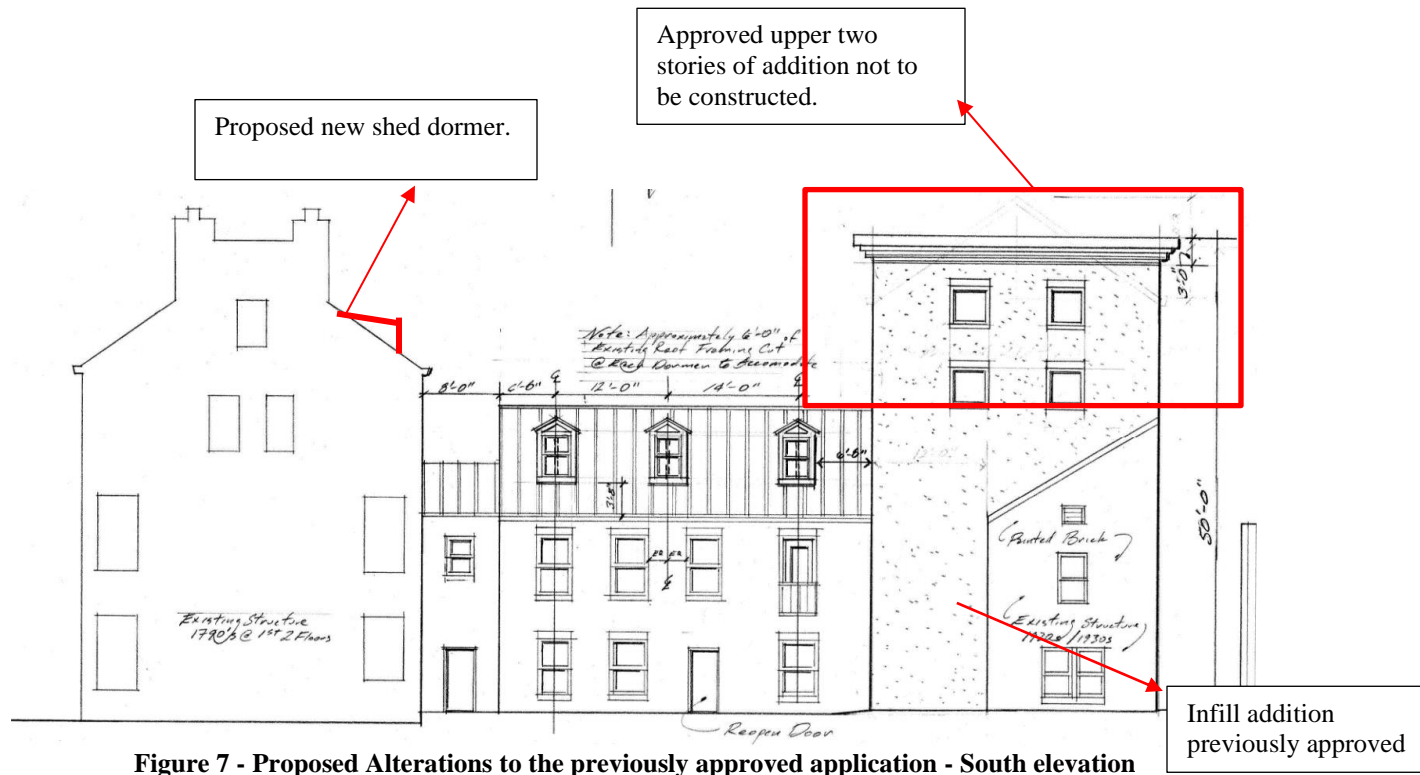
Proposed Alterations to the previously approved application - South elevation
